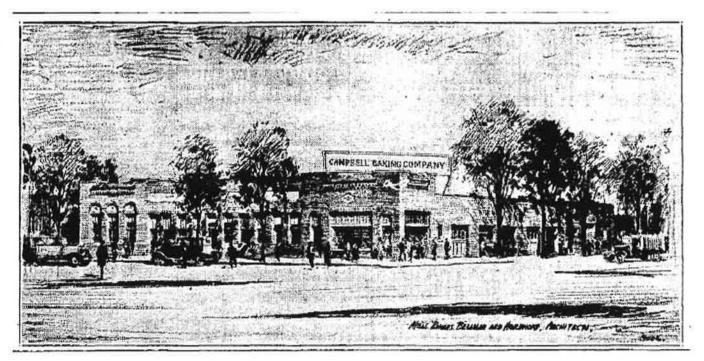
The Waterloo Evening Courier published this architects' drawing of the planned new Campbell Baking Company building on July 30, 1927.
